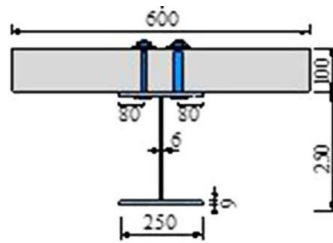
Typical cross-section of steel beams HM250x125x9x6 [40].
